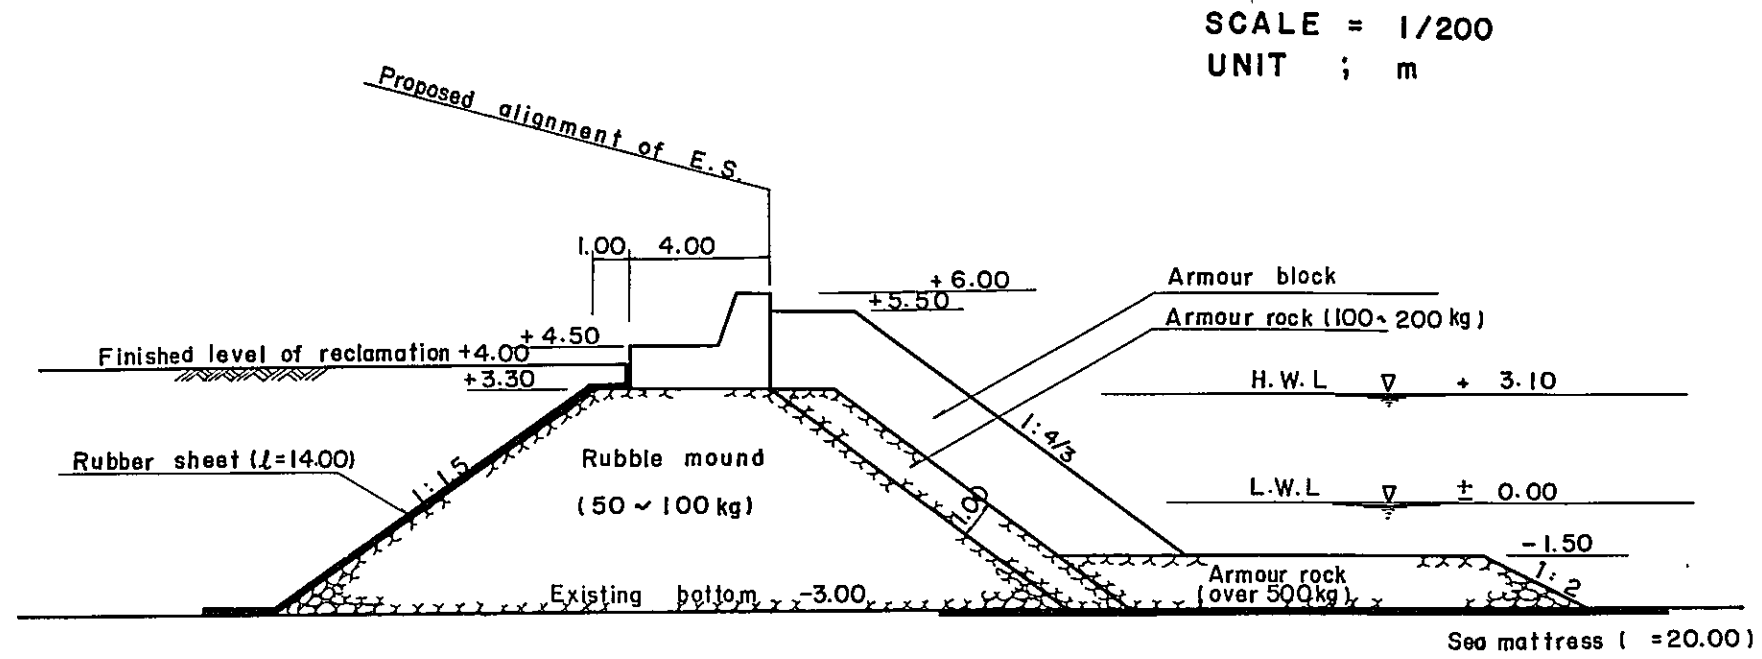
(c) STANDARD SECTION OF EAST BREAKWATER
